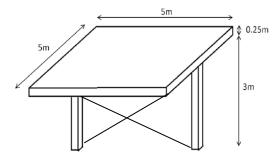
Reinforced concrete moment resistant frame with cross bracing members
